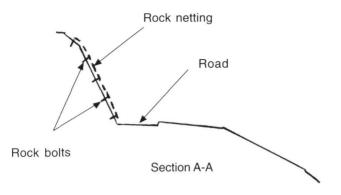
Cross Section of Repaired Rock Slope Using Wire Betting at Location 10
